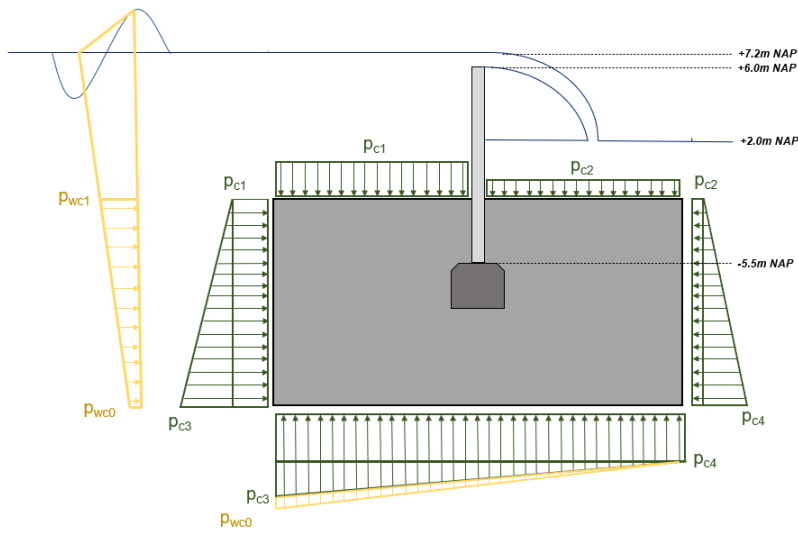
The hydrostatic pressures on the caisson foundation of the barrier that will be considered in the stability assessment (image NTS)
